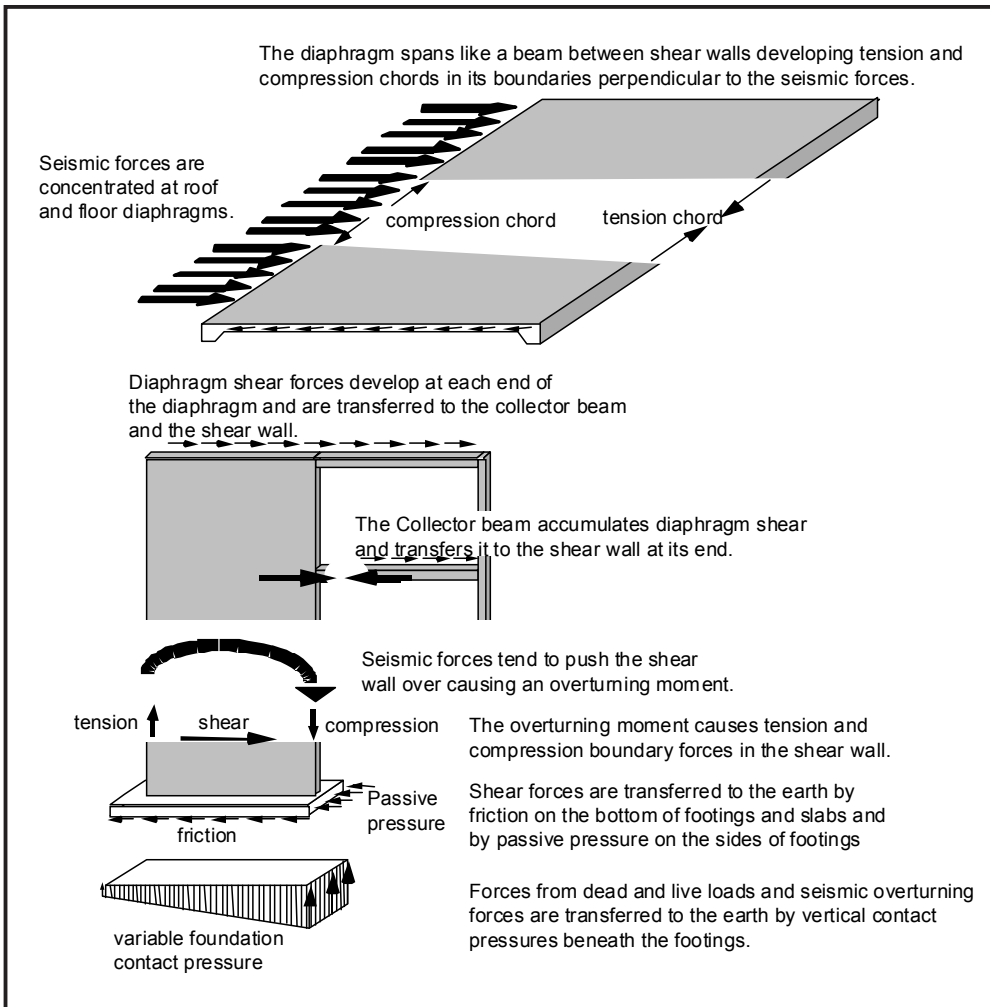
The effects of earthquake shaking on concrete and masonry buildings
